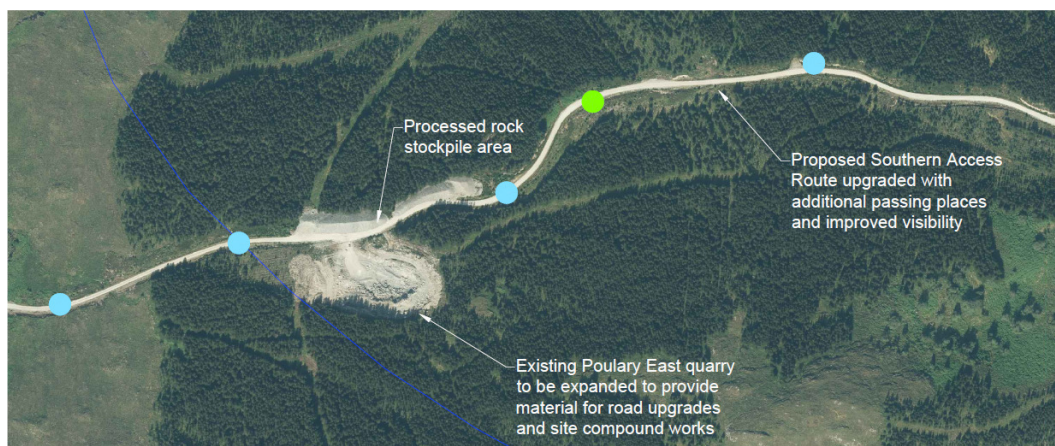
Sample of additional passing places and yhe existing Poulary East borrow pit on existing forest road along SAR
